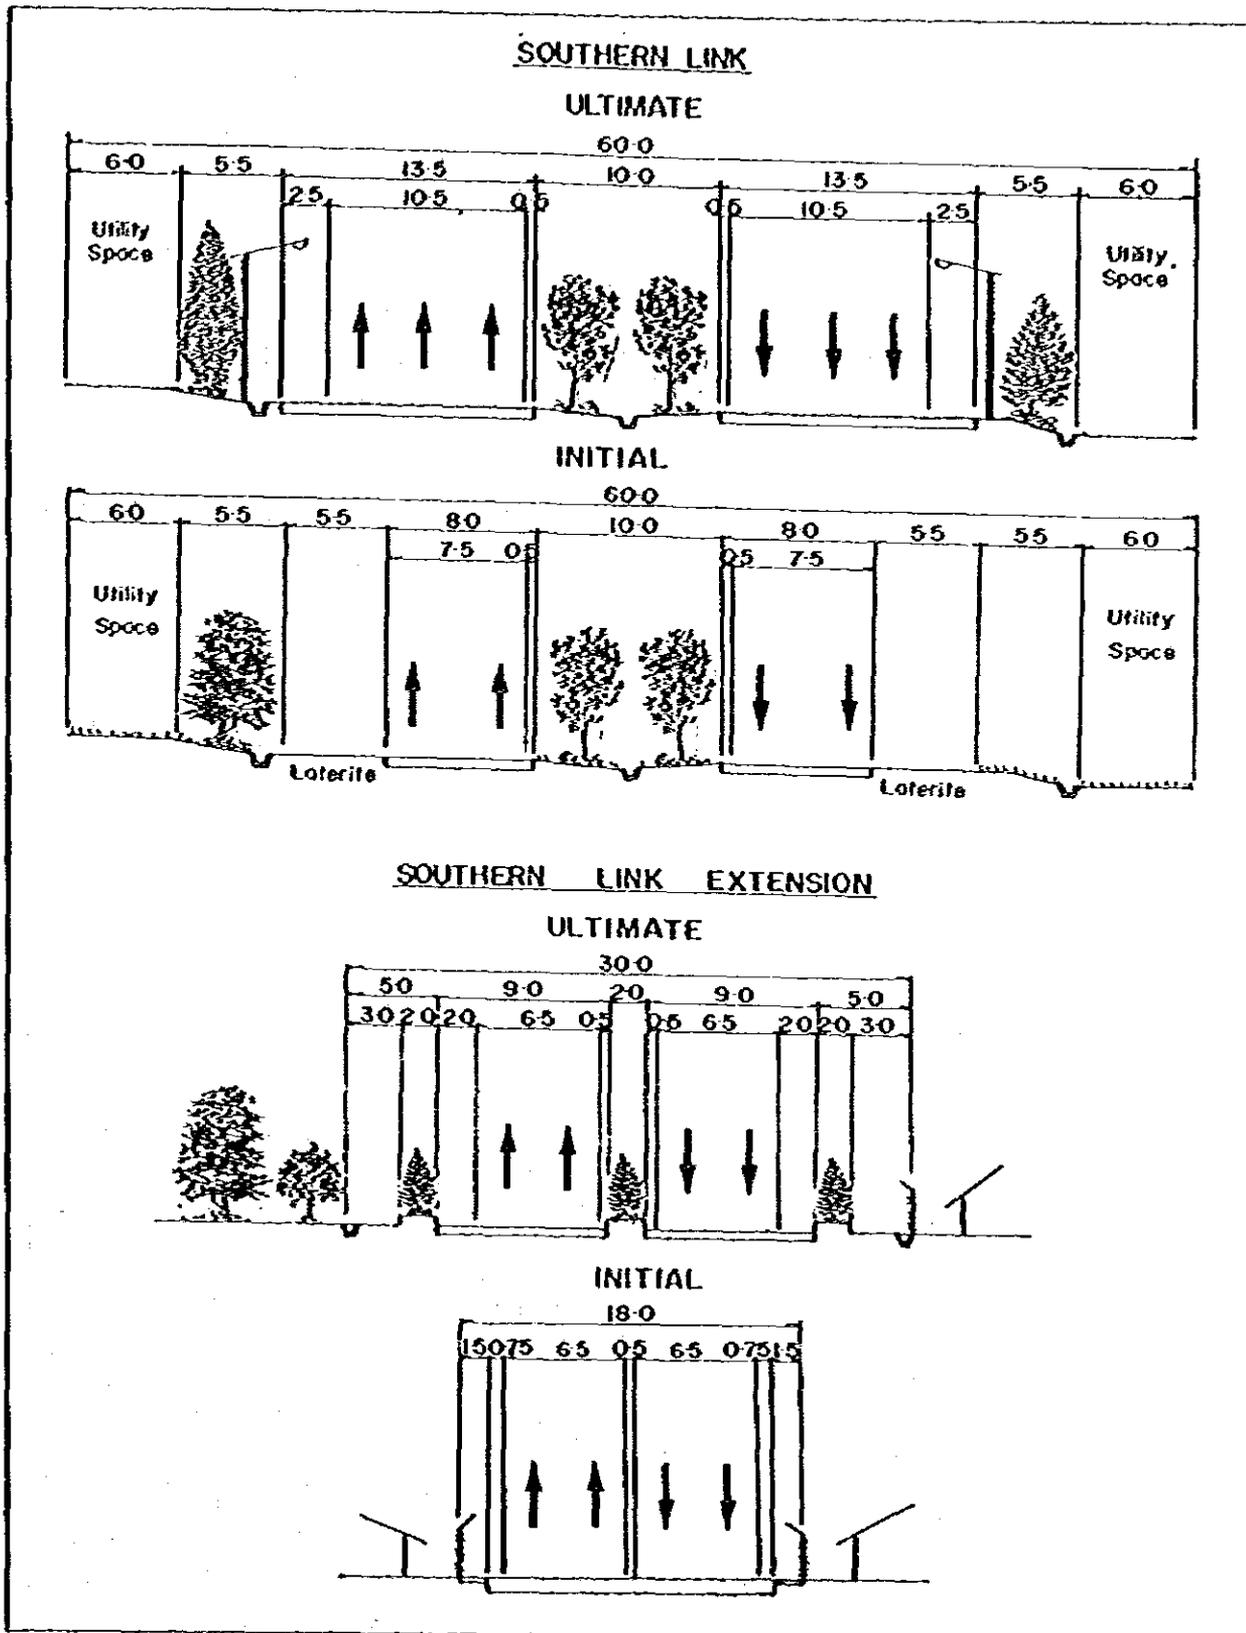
TYPICAL CROSS SECTION: SOUTHERN LINK AND ITS EXTENSION
